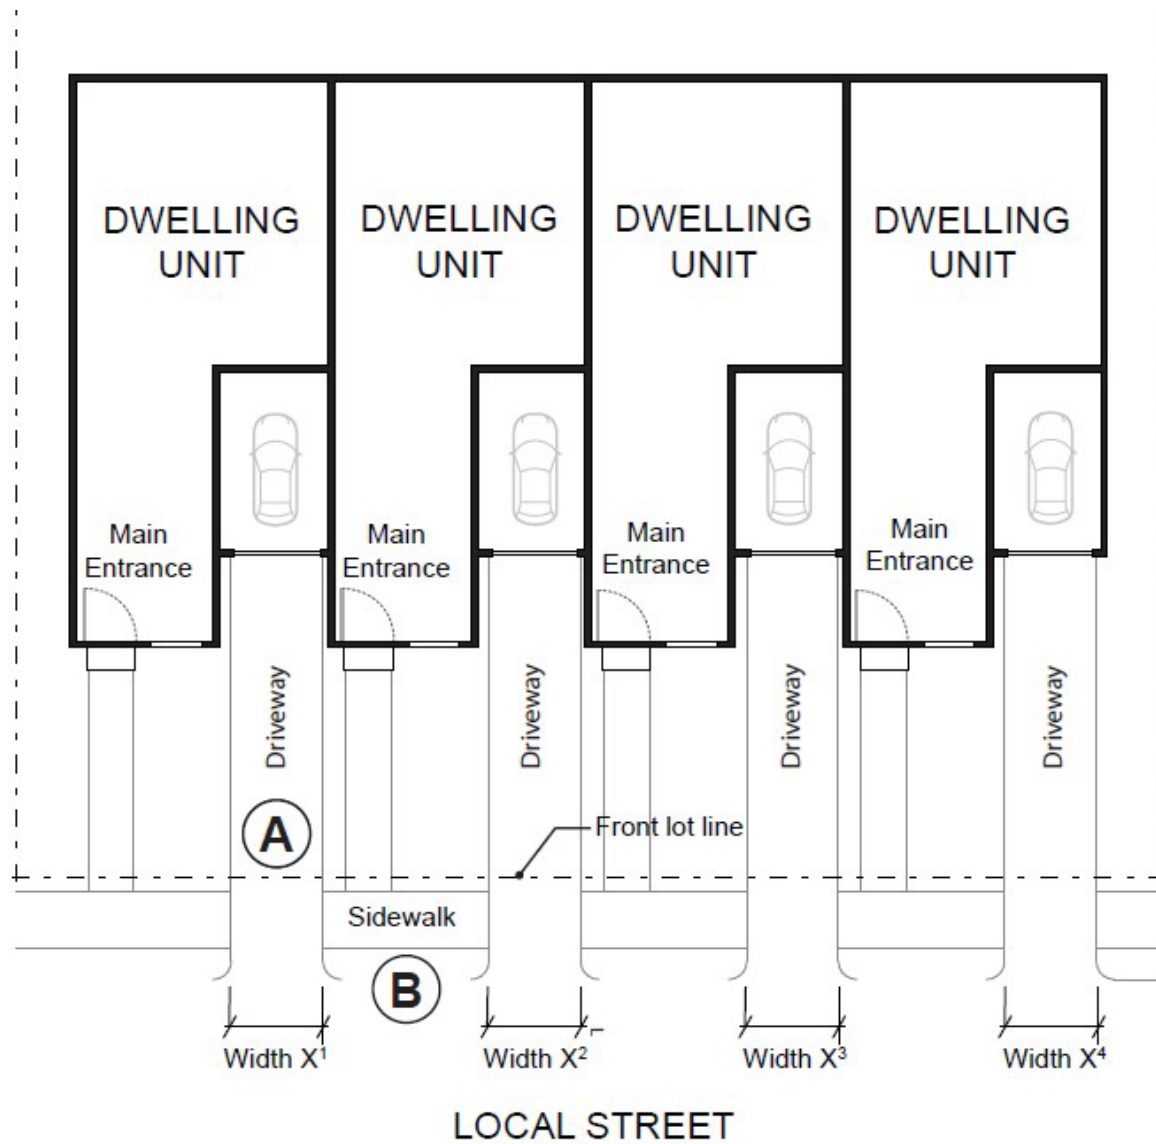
(4)(a)2. Triplex/Fourplex Width of Garages and Parking Areas
